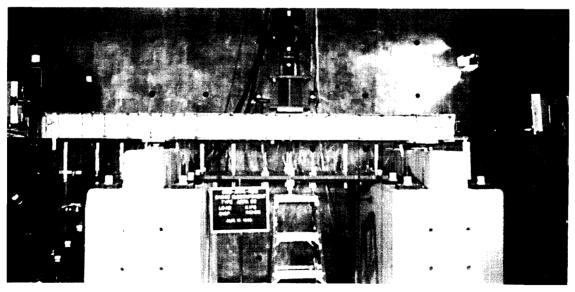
View of the Test Setup and a "Box" Configuration Deck Component
